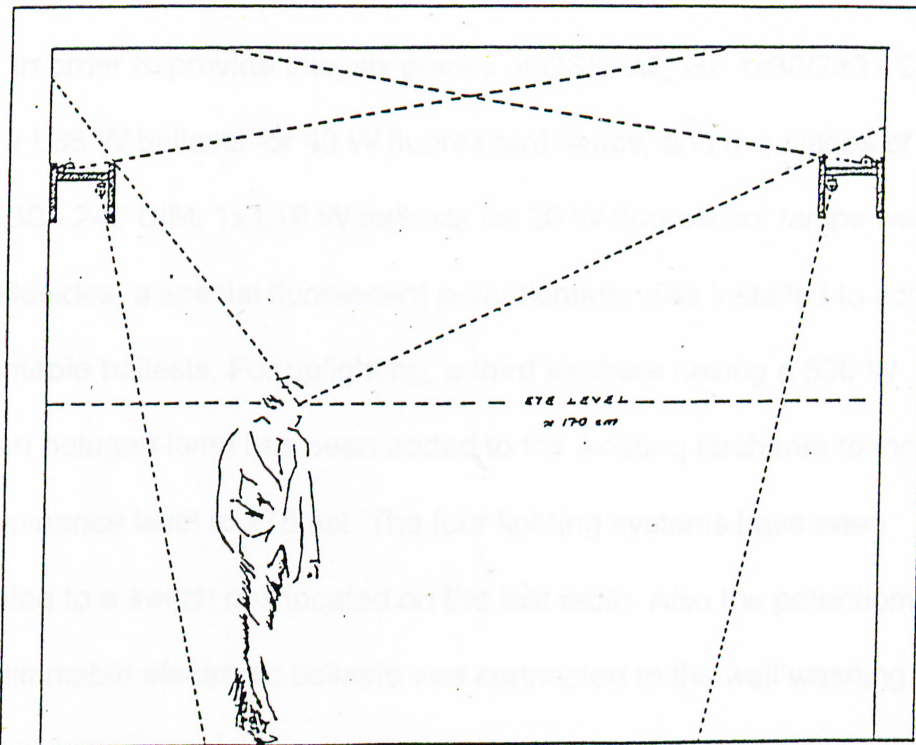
Cove lighting and wall washing installations arrangement in room
